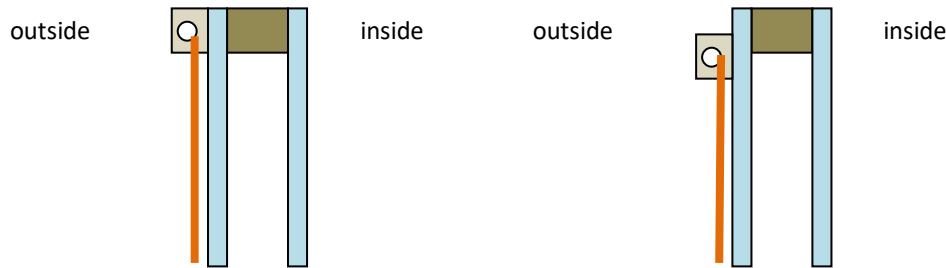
Outdoor woven shade is located on the outside of the glazing system.
